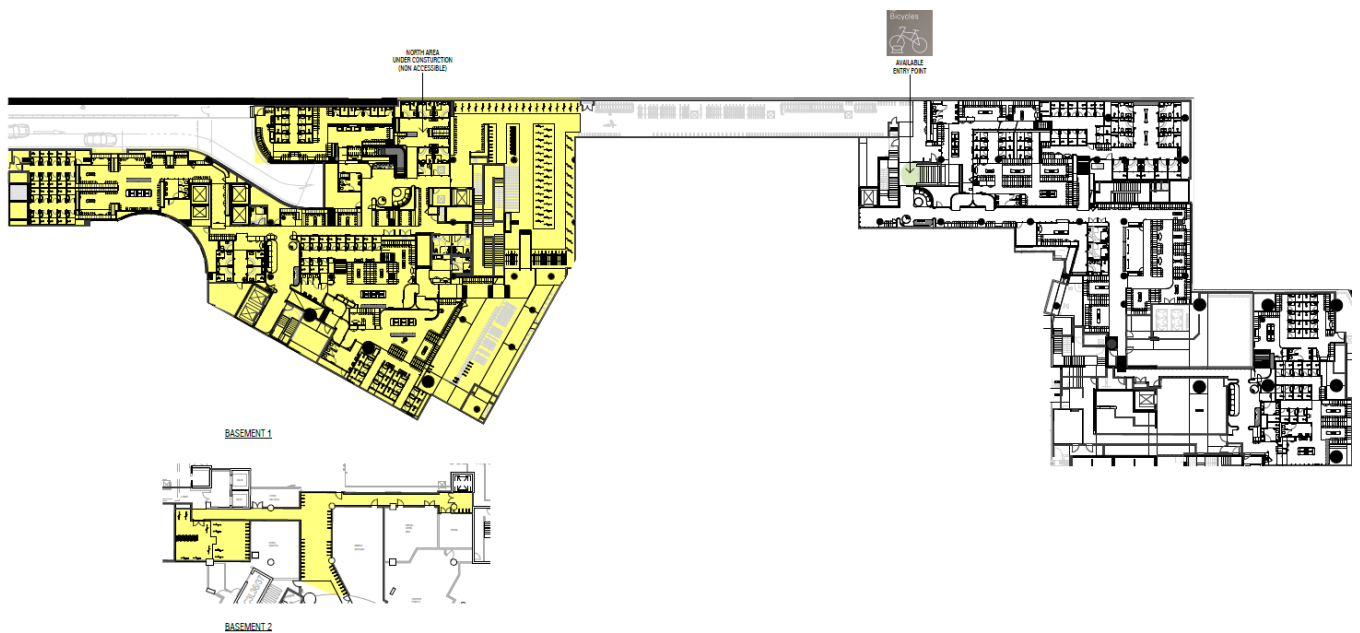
Stage 2: Demolition and Construction of the northern EOT facilities
